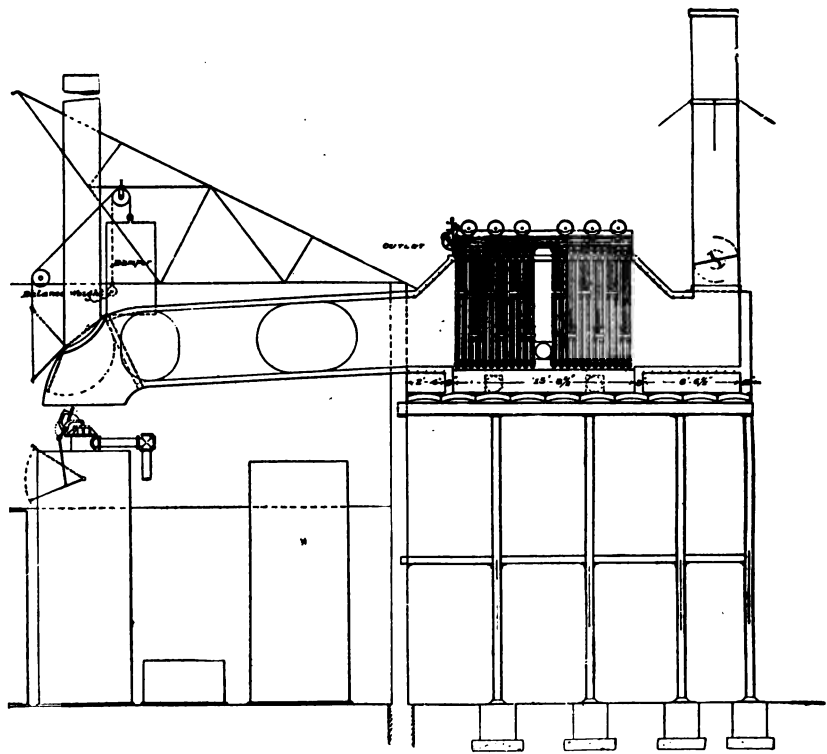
CROSS SECTIONAL ELEVATION OF NEW HAVEN INSTALLATION.
